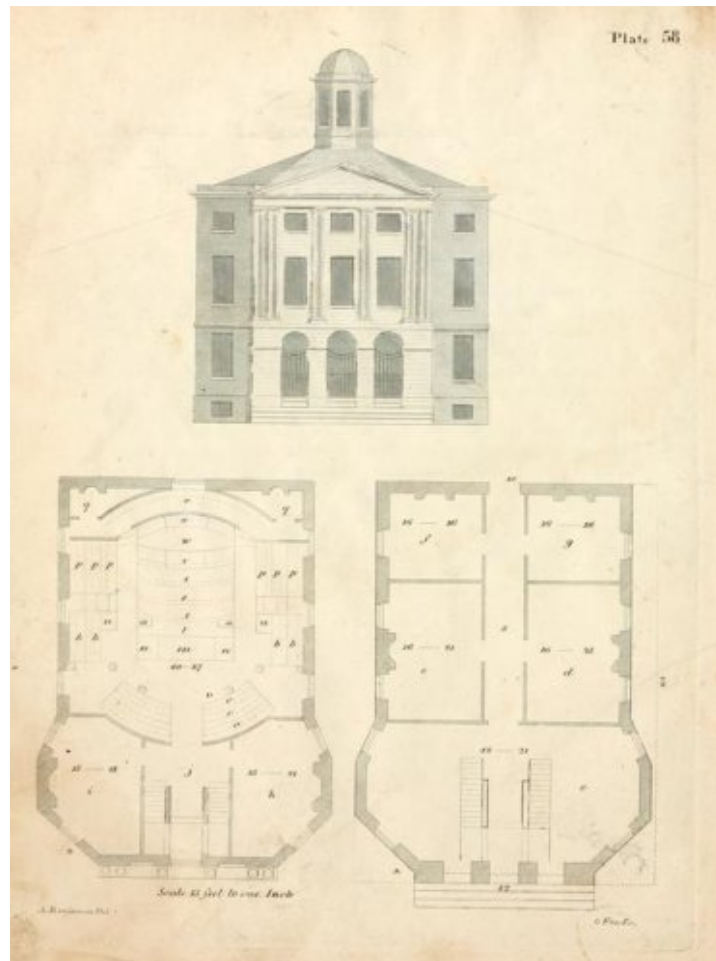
Asher Benjamin's "Plan and Elevation for a Courthouse" from *The American builder's companion*. 1816. Plate 58.
